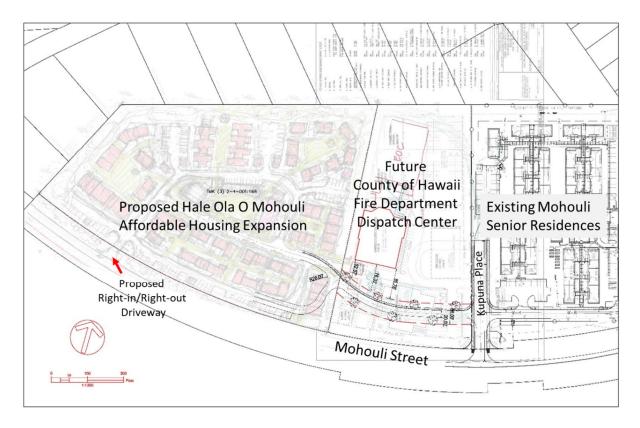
Hale Ola O Mohouli Conceptual Site Plan
